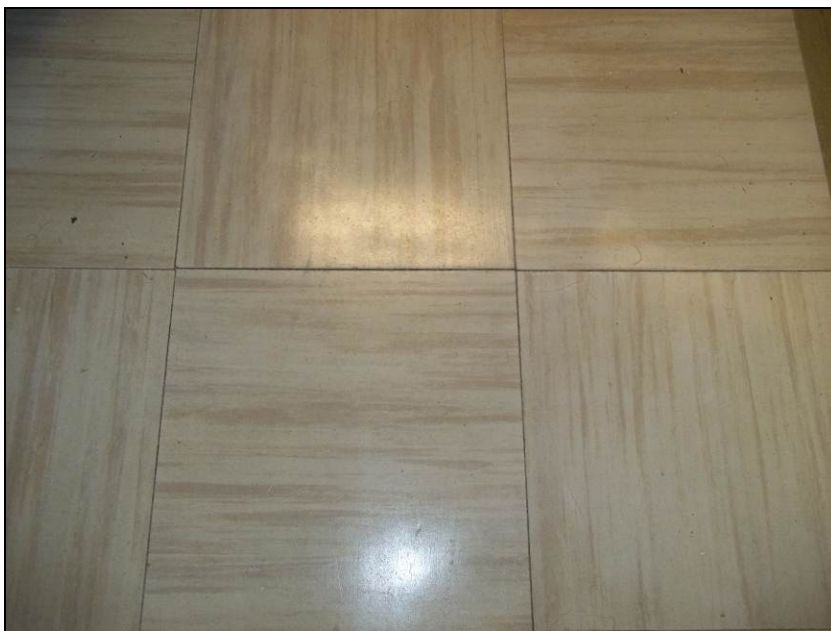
Sample GB-6. Asbestos containing vinyl floor tile.
